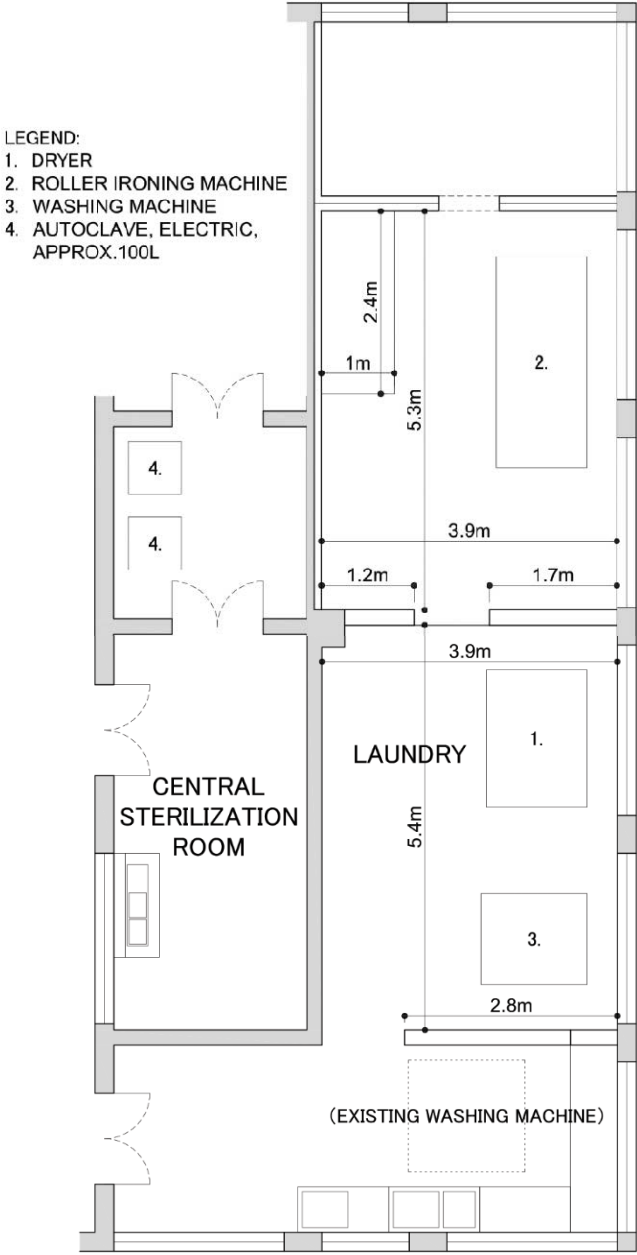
Equipment Layout in Central Sterilization Room and Laundry at Soroti RRH
